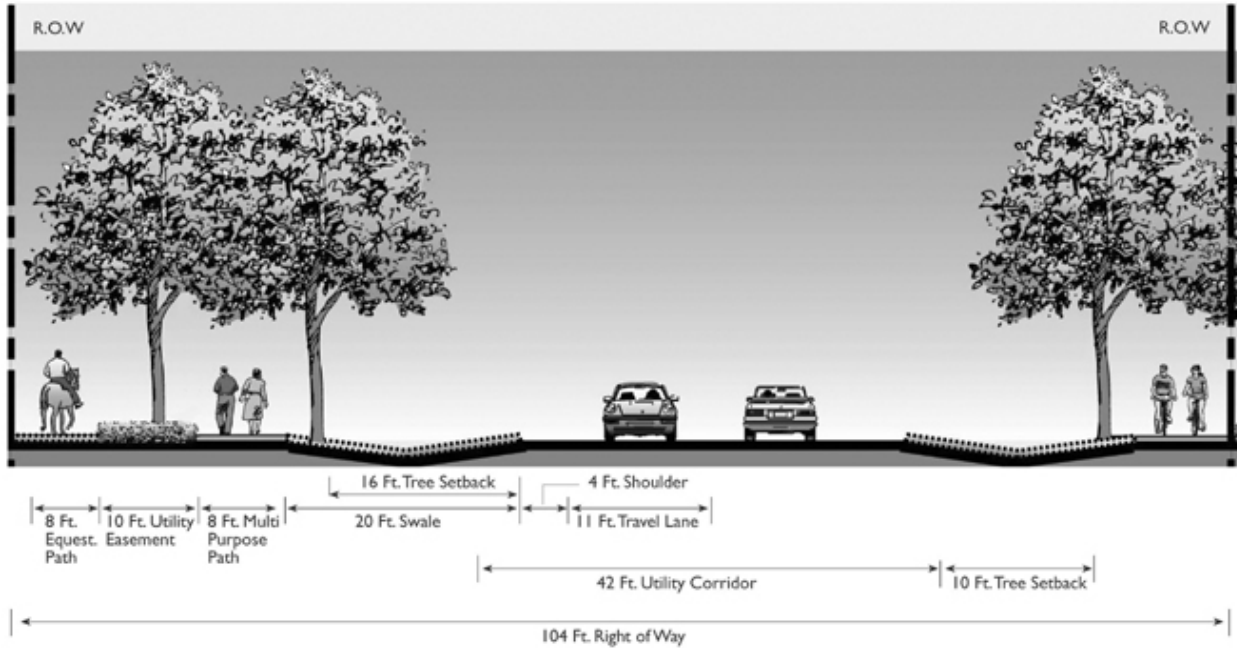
F.2.A-16 TDD Exurban/Rural/AGR (Non-Plan Roadway - Collector)
